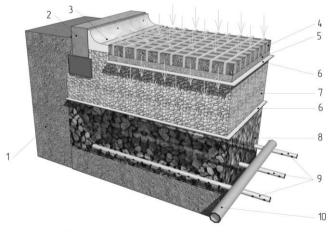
Model of infiltration area: 1 – underlying soil; 2 – kerb; 3 – opened tray; 4 – plastic paving grids; 5 – bedding layer; 6 – geotextile; 7 – structural base layer; 8 – storage base layer; 9 – drainage pipes; 10 – manifold
